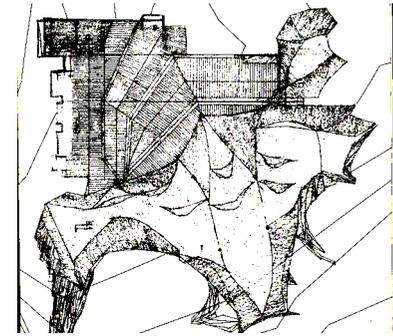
Roof Plan of Dipoli, Riema and Raili Pietilä, 1966 (*Riema Pietilä: architecture, context and modernism*)
